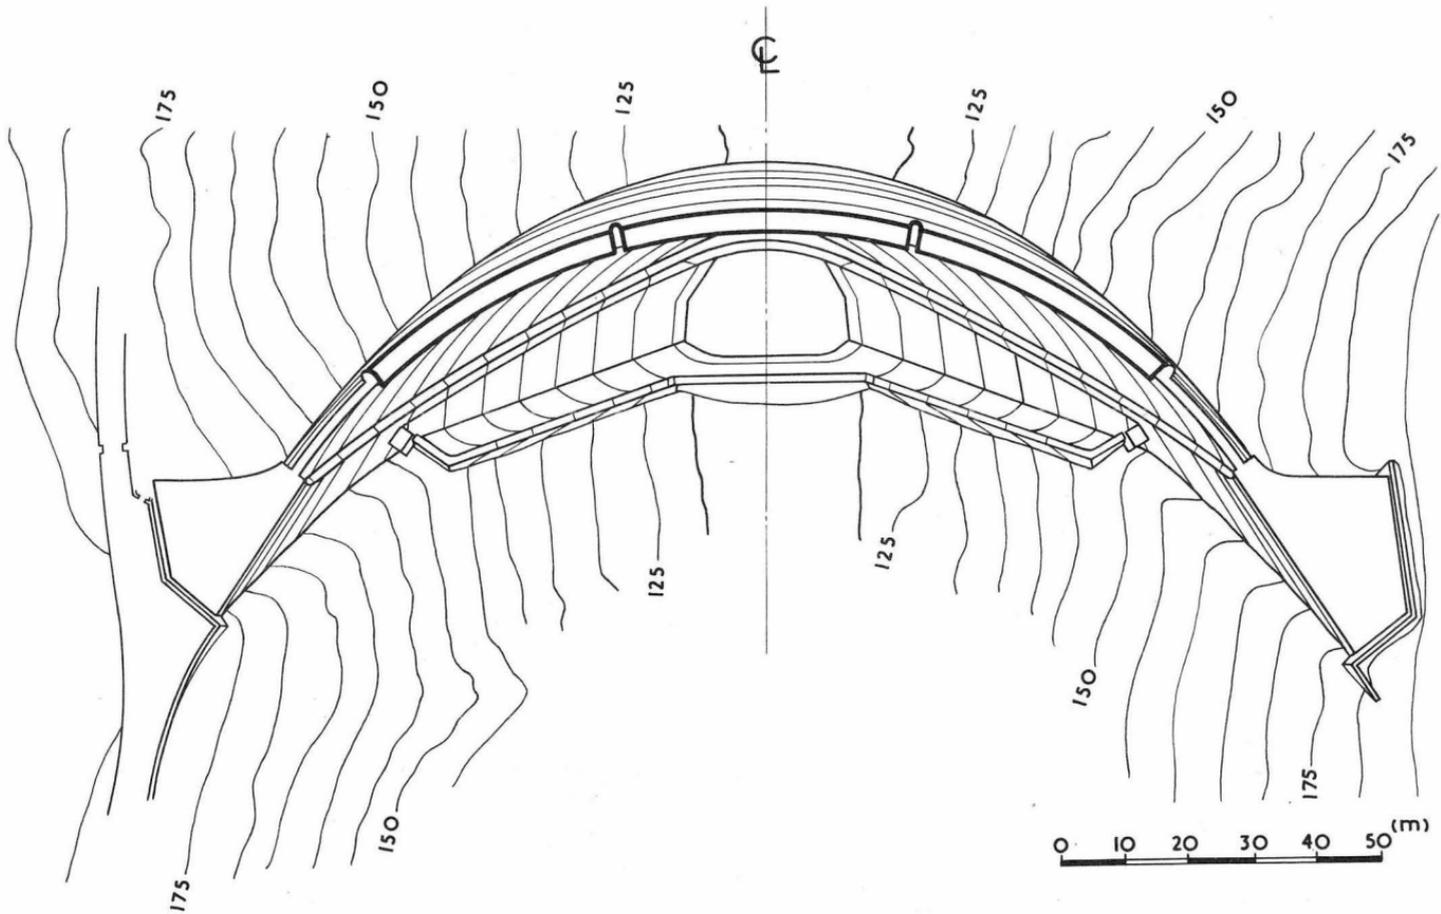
BOUÇÃ — PLAN OF THE DAM AND SPILLWAY
